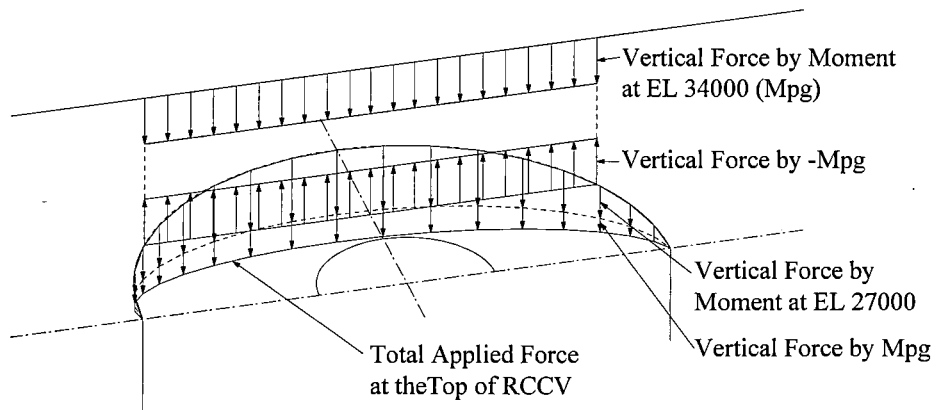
Application of Overturning Moments to the Pool Girders
